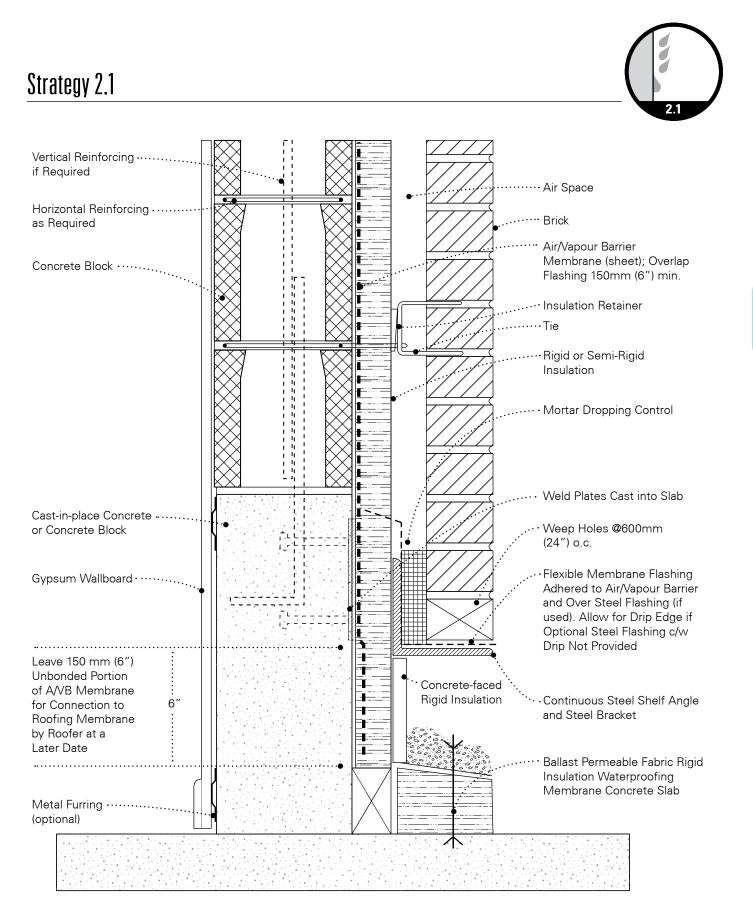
R Roof-to-Wall Intersection Adapted from CMHC (1997).
